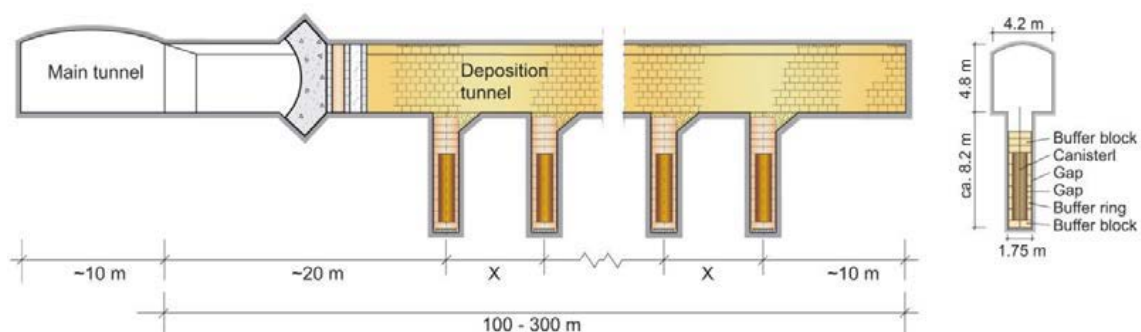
Proposed theoretical section of a deposition tunnel, with height 4.8 m and width 4.2 m.
